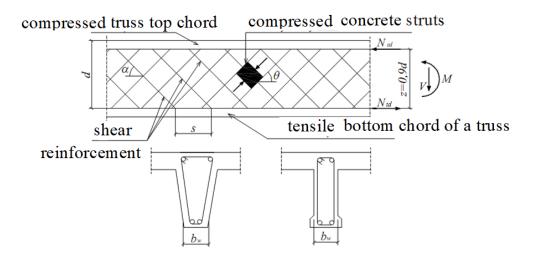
"Truss analogy" for calculating flexural members in an inclined section
